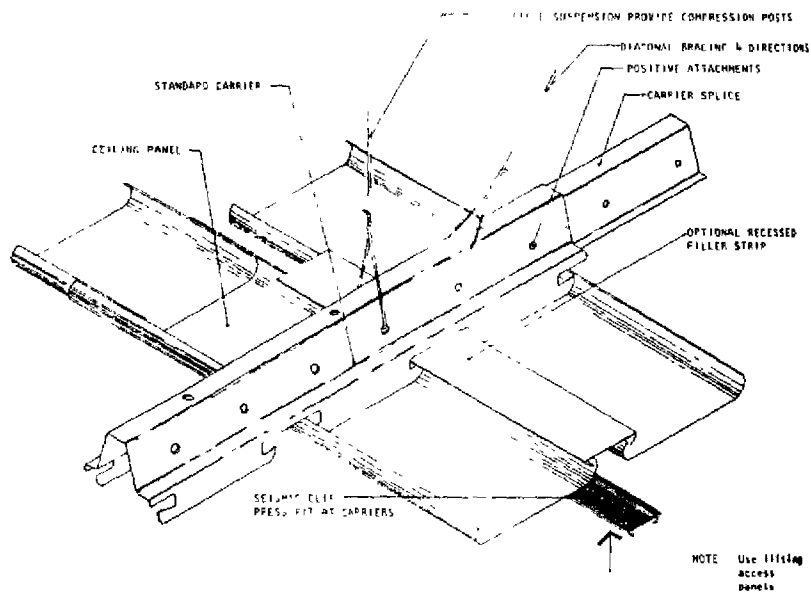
Suspended ceiling systems. Metal ceilings. (Courtesy Alcoa Aluminum Ceiling Systems.)
